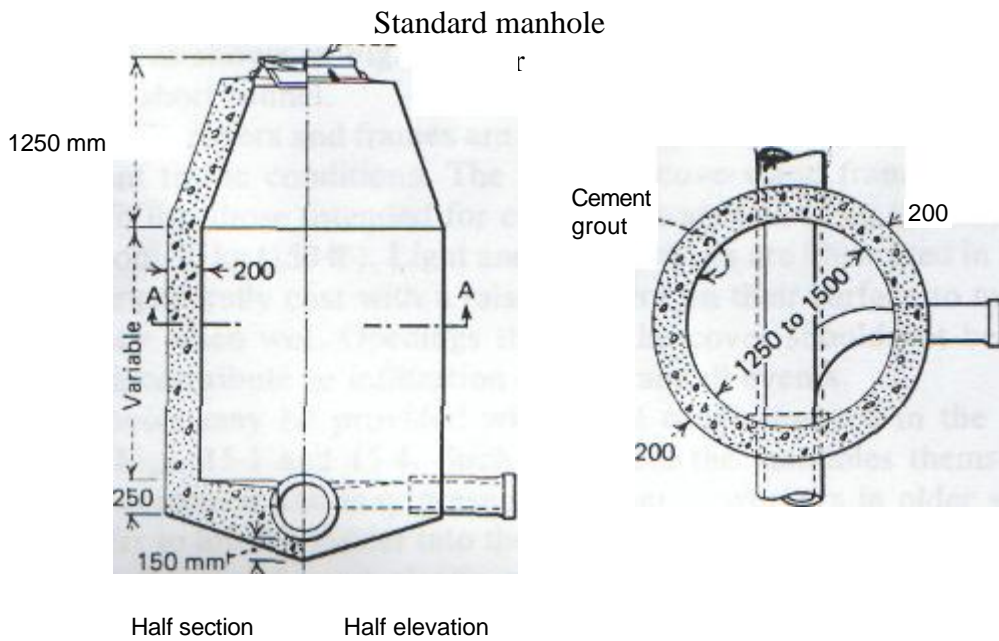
2 Concrete Manhole with junction of branch sewer
